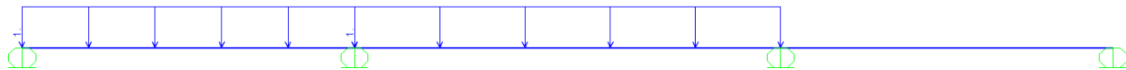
Story County bridge - controlling truck loading conditions for deflection
